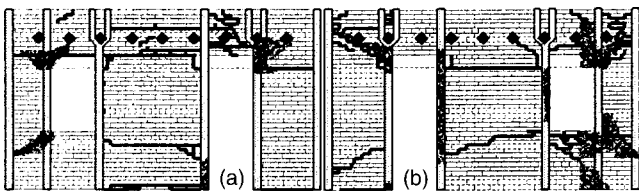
Crack pattern on repaired shear wall after La Malbaie $\times 4.0$: (a) west wall and (b) east wall (shaded area indicates Tyfo material debonded)
